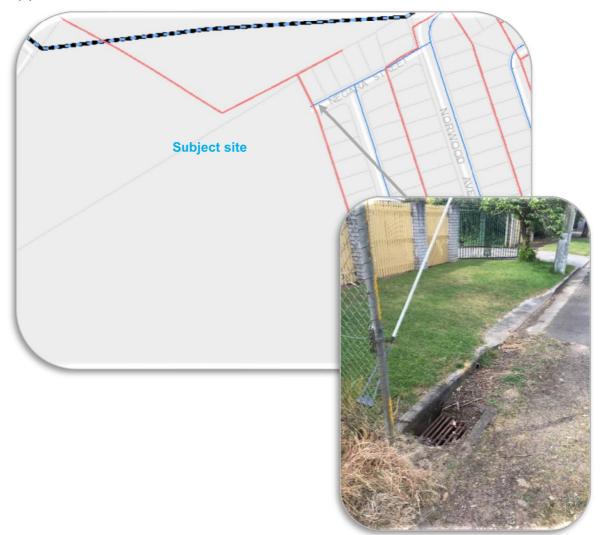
Water and Sewer identified mains, as well as Stormwater drainage in Negara Street. Source: LISTMAP & photo.
